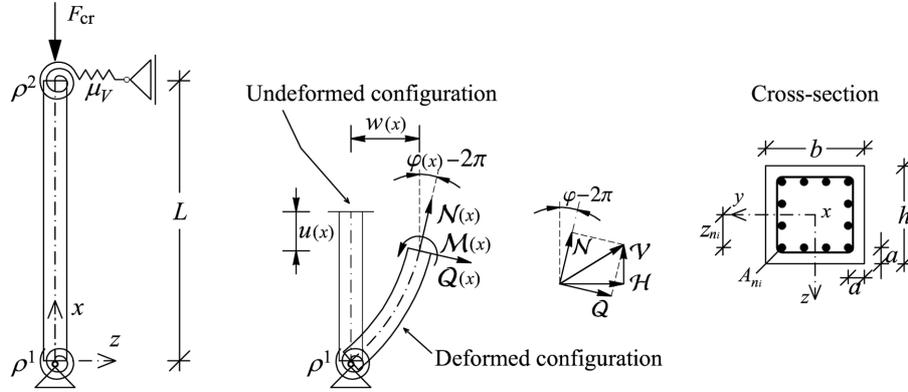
Deformed and undeformed configuration of a restrained RC column. Reinforced concrete cross-section
